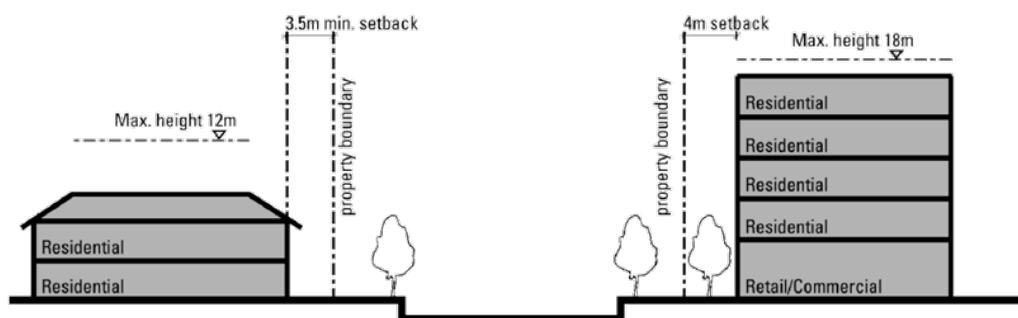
SECTION THROUGH MAIN STREET (TYPE 6)
